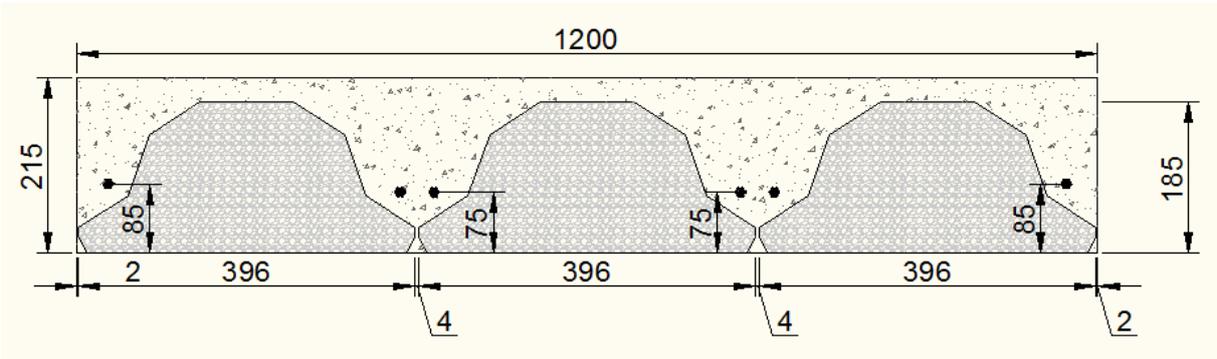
Cross-Section through the center of light aggregate concrete blocks.
